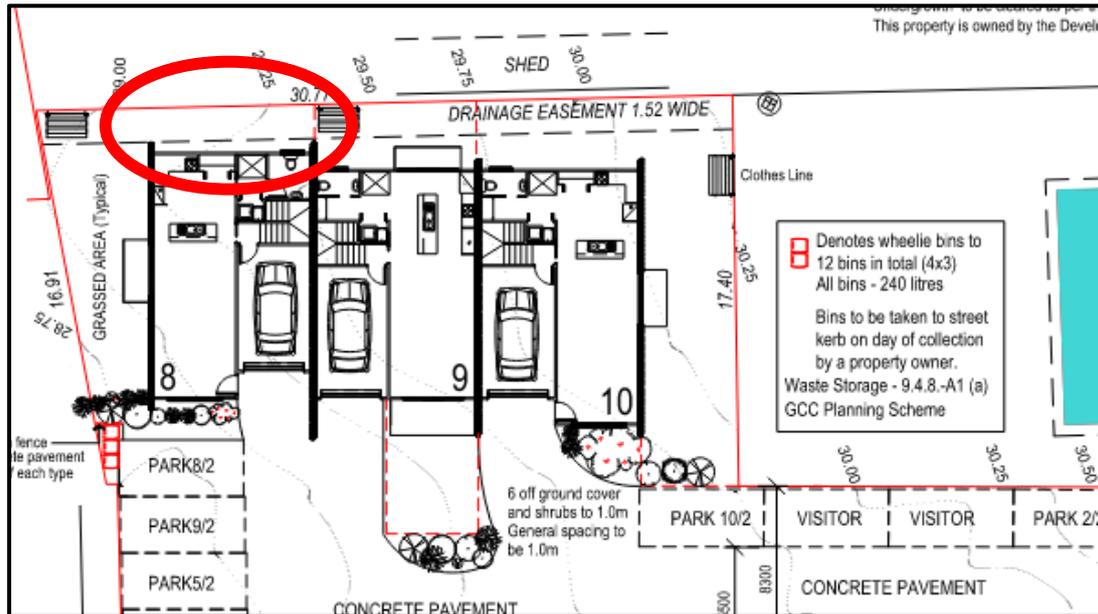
Unit 8 site plan for 21 Coleman Street, Moonah.
